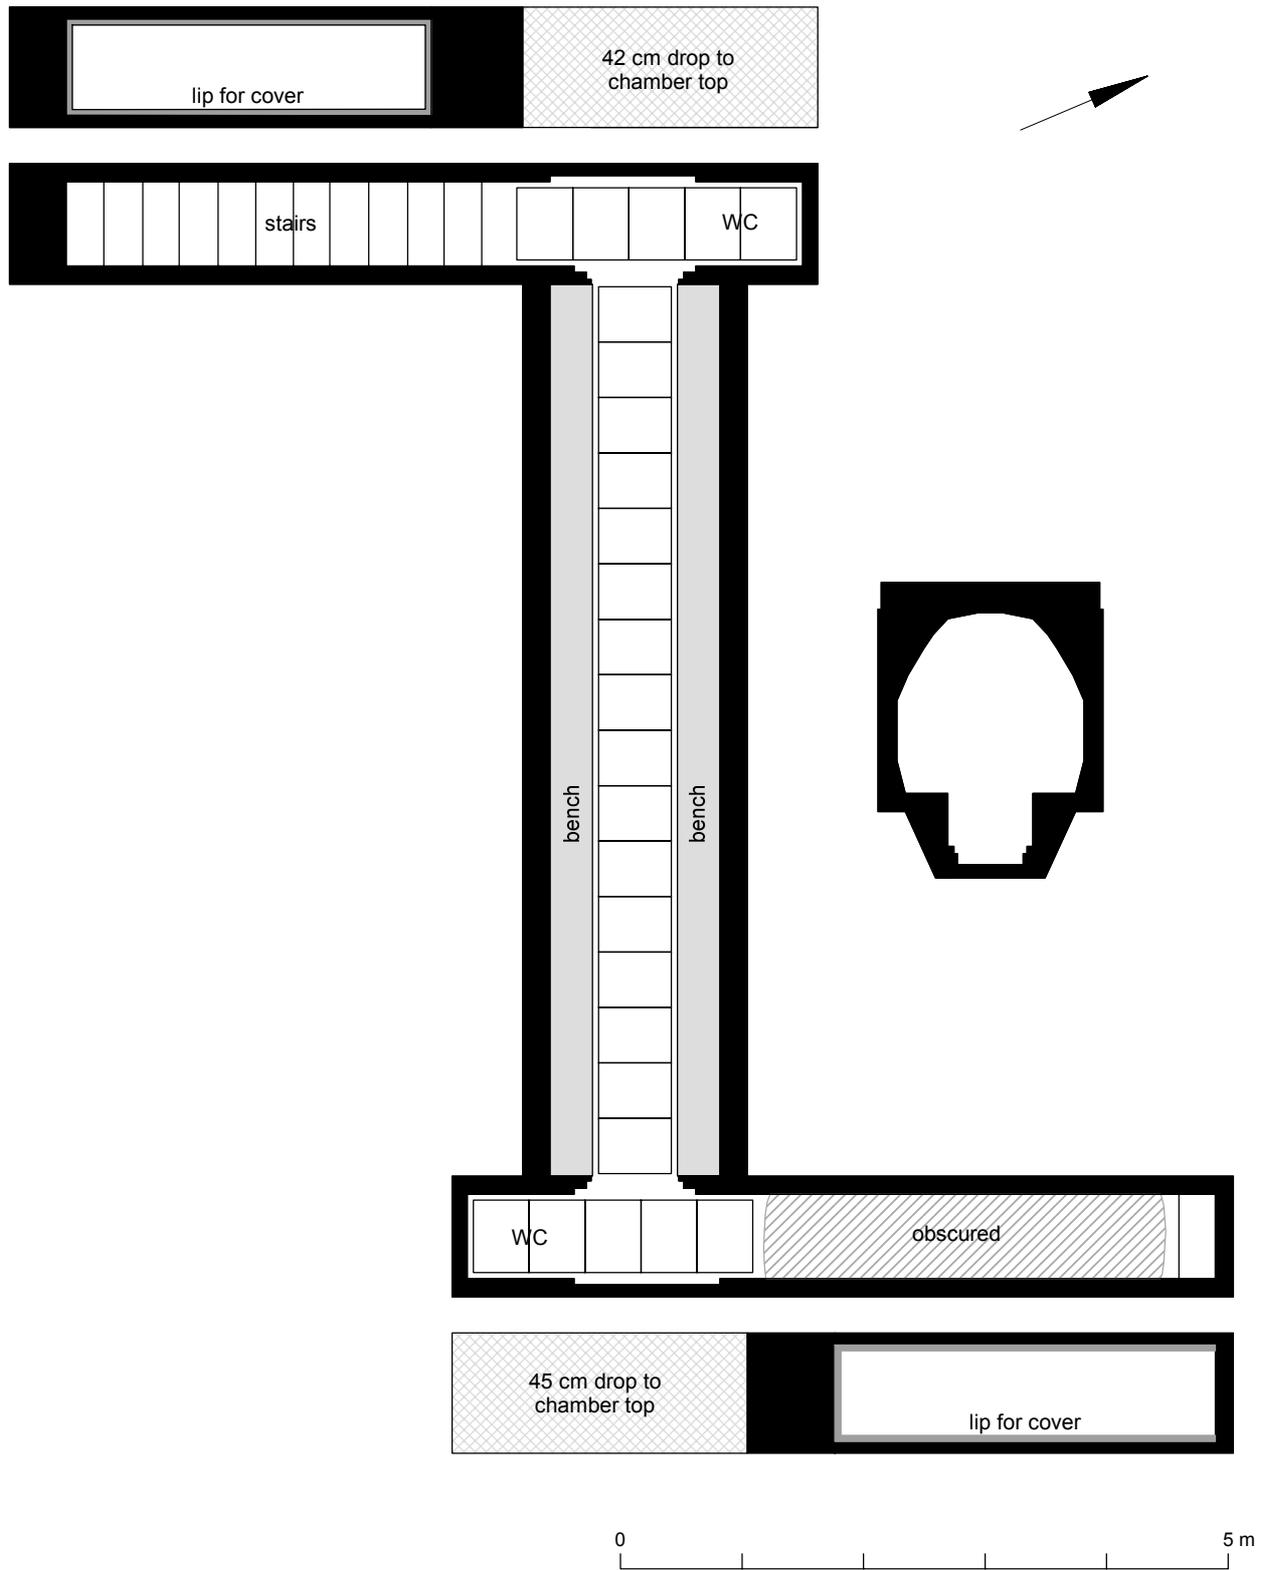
Area J1, air-raid shelter F5: internal plan and cross-section of chamber.
